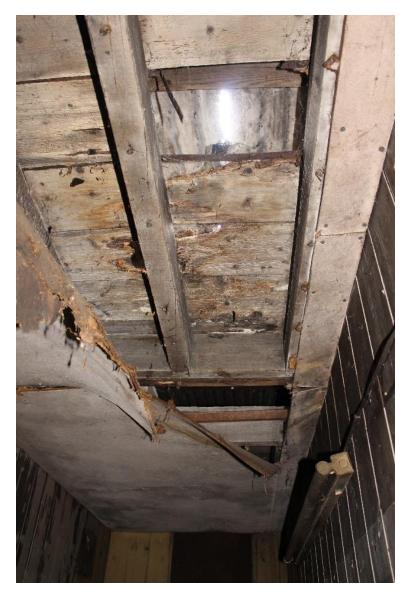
Internal view NNW of ceiling joists within the storage area adjoining office compartment
